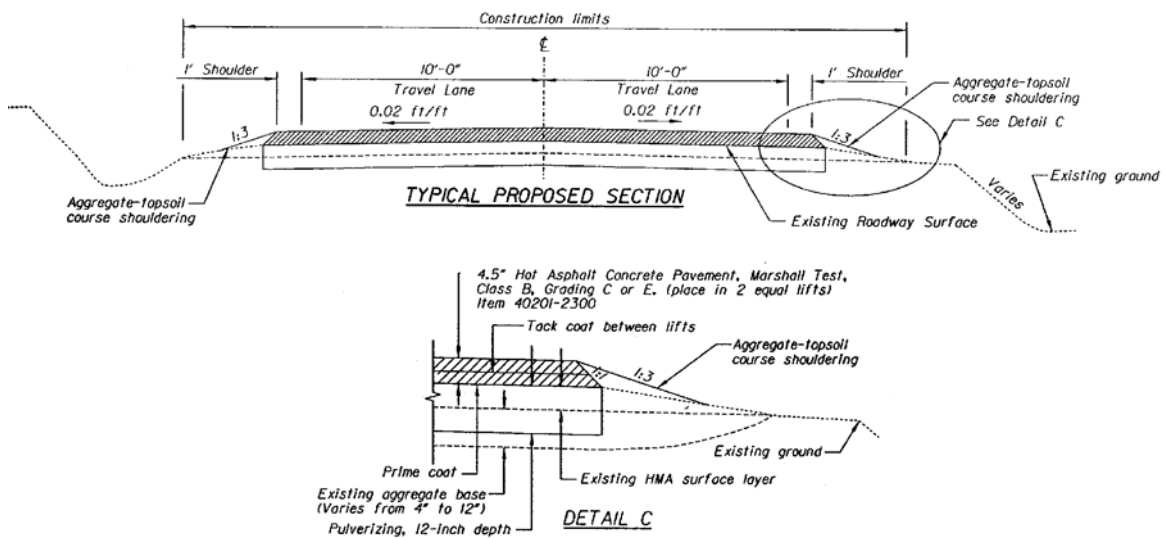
Typical Proposed Road Improvement Cross-Sections.
